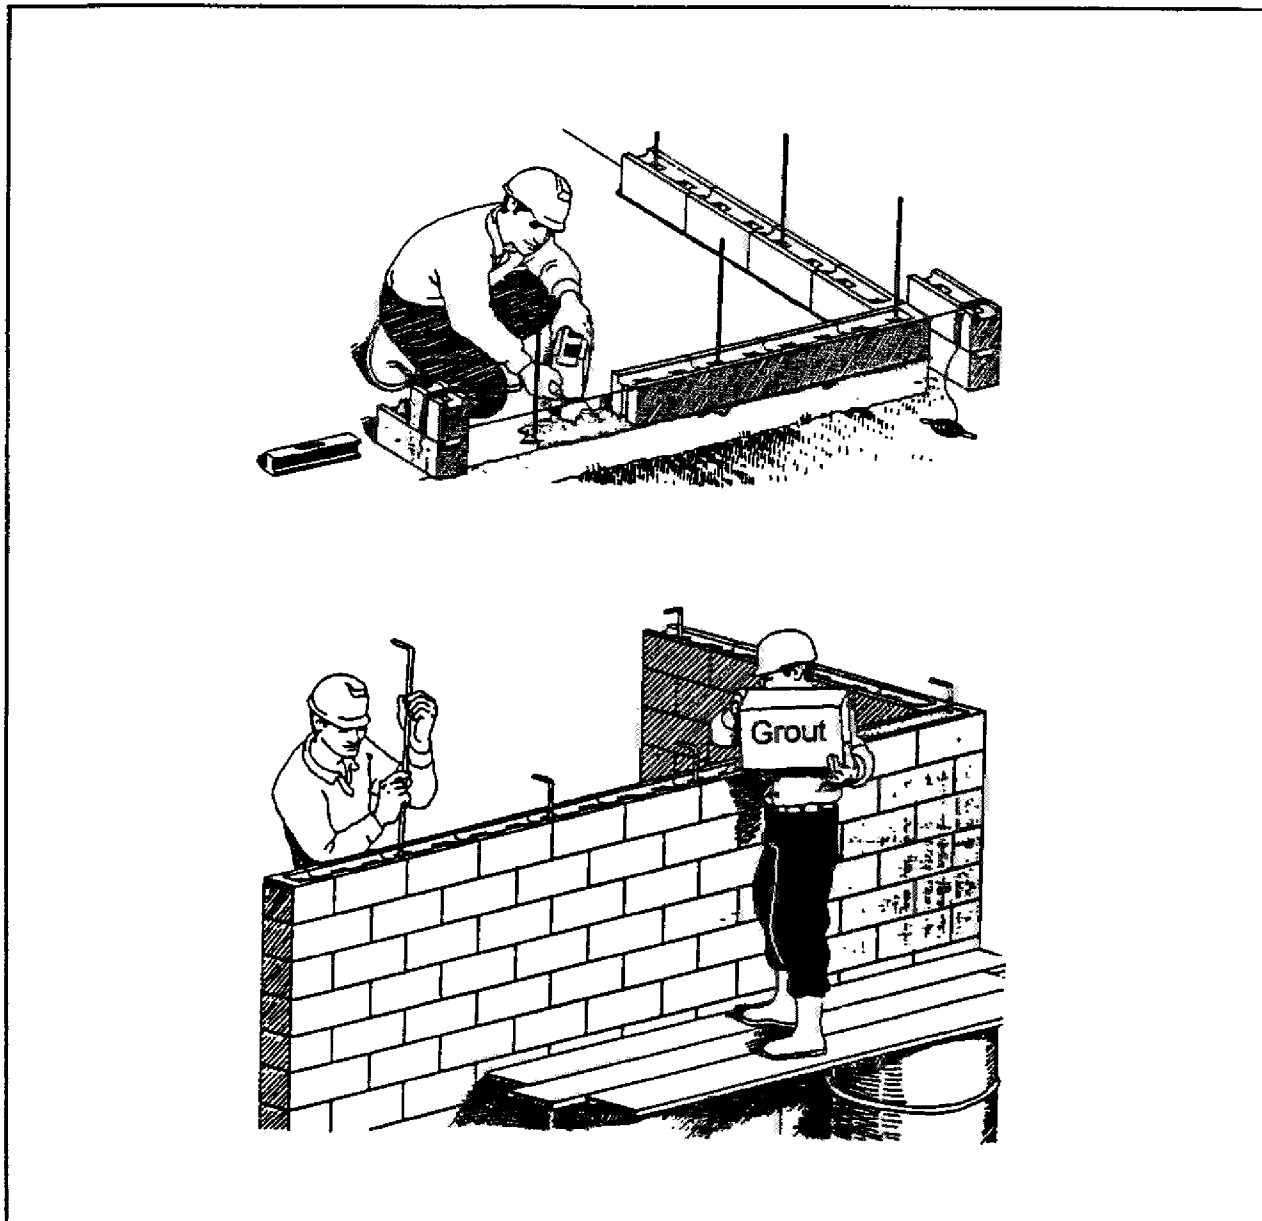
Vertical Reinforcement in Hollow Block Masonry using Grout [11].
